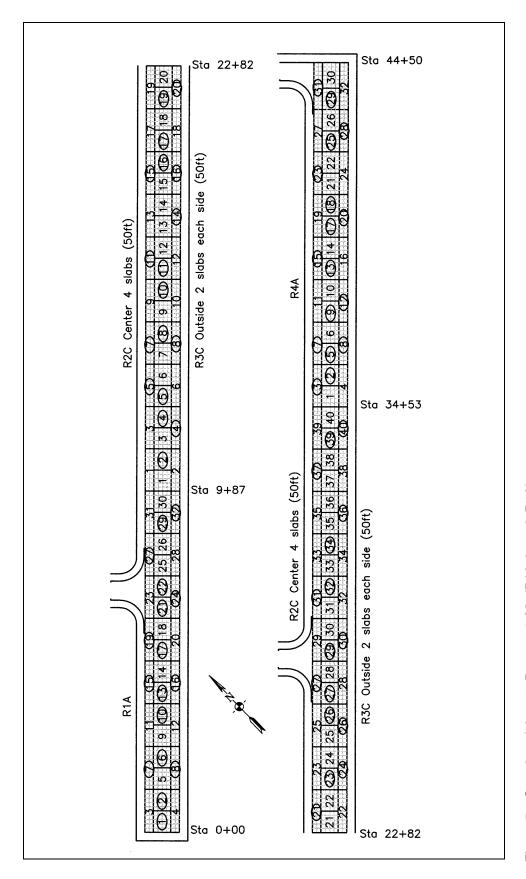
Sample unit layout, Runway 4-22, (R1A through R4A)
